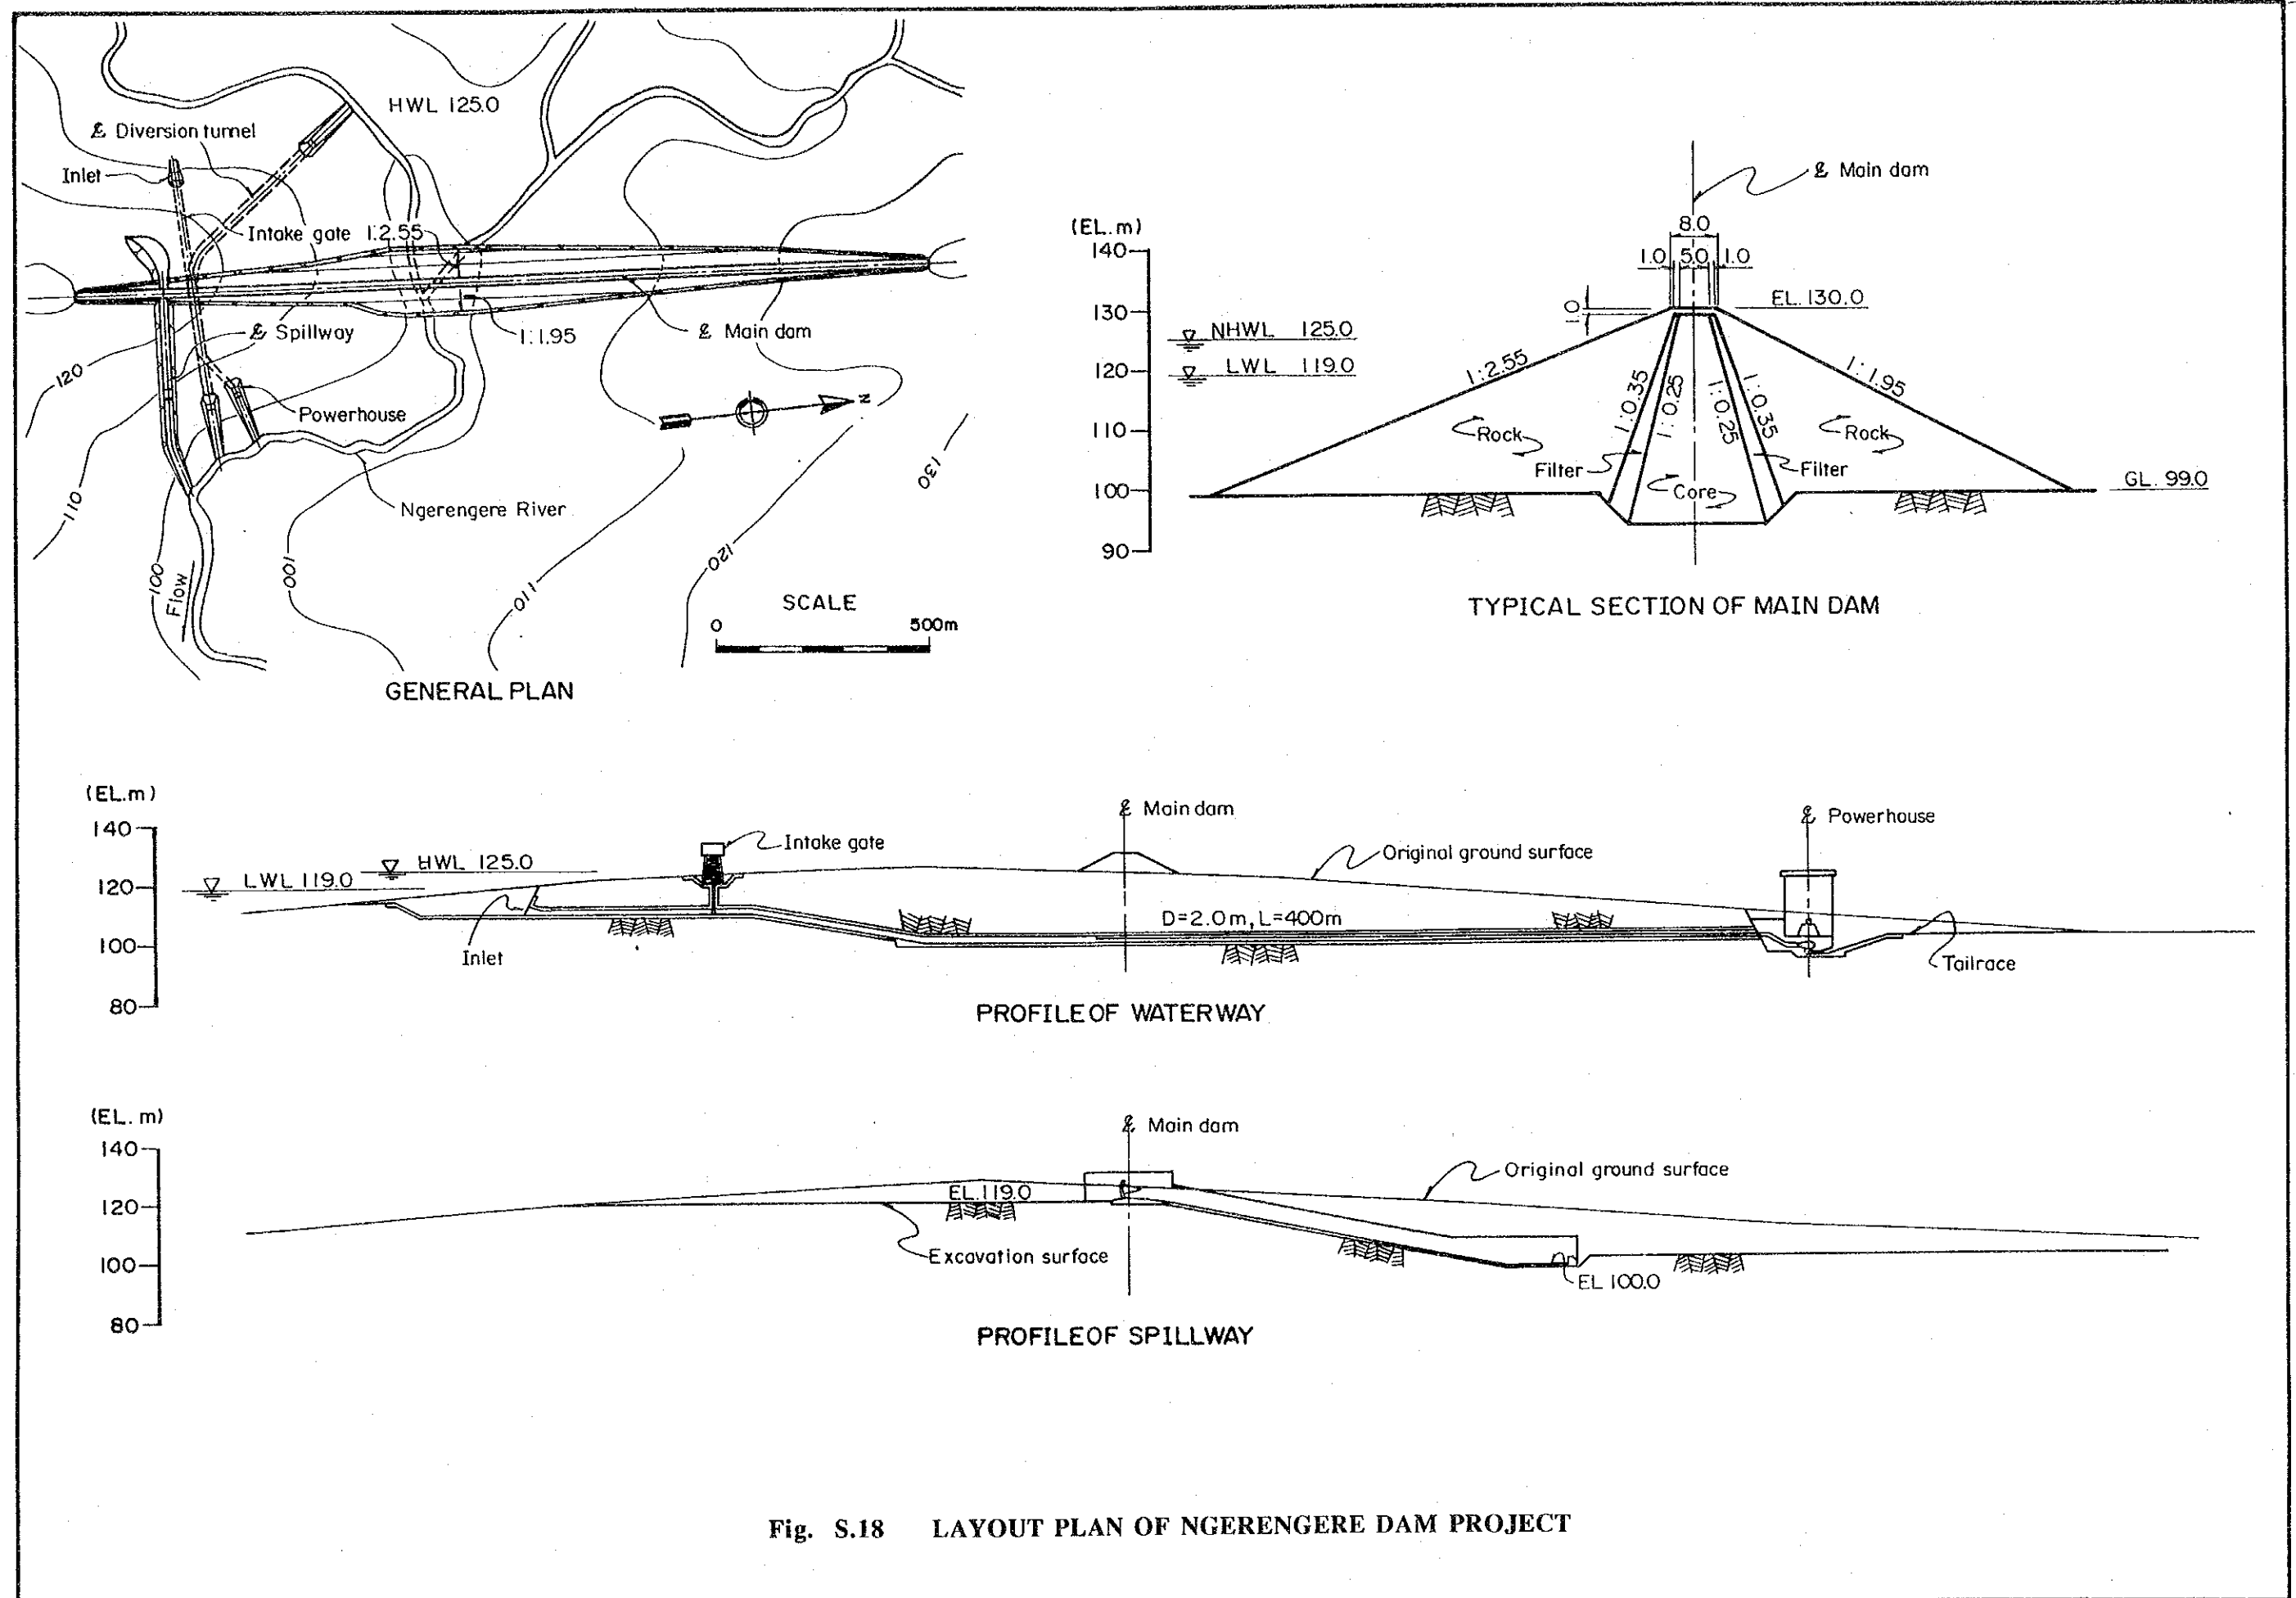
LAYOUT PLAN OF NGERENGERE DAM PROJECT
